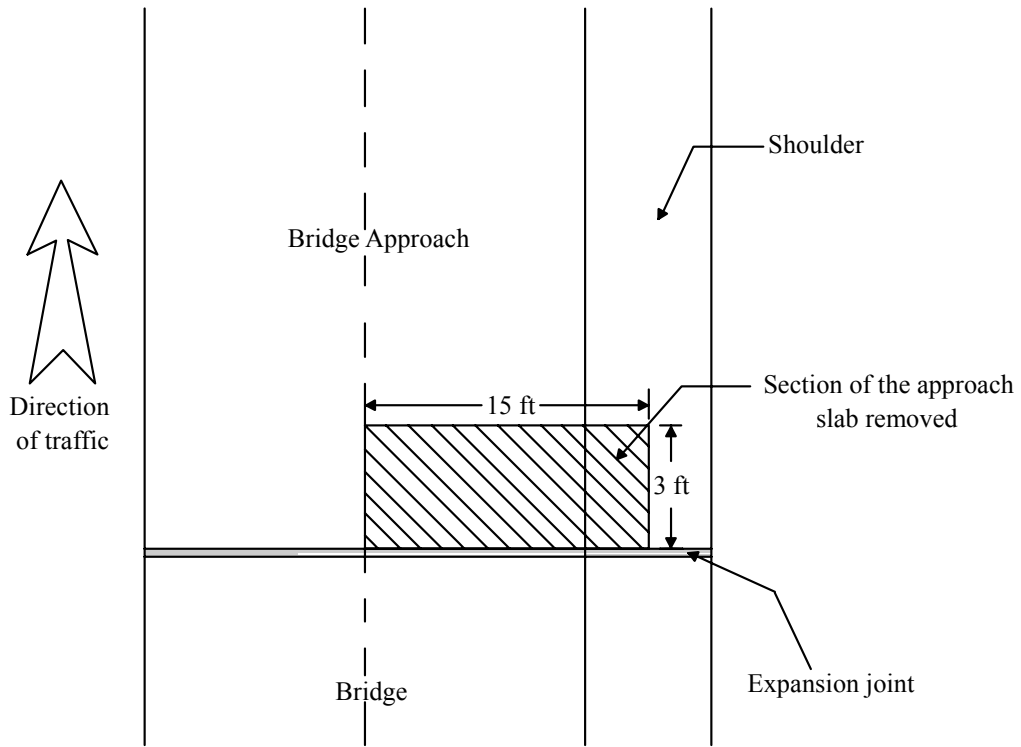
Top view of the bridge with the location of removed approach slab for inspection
